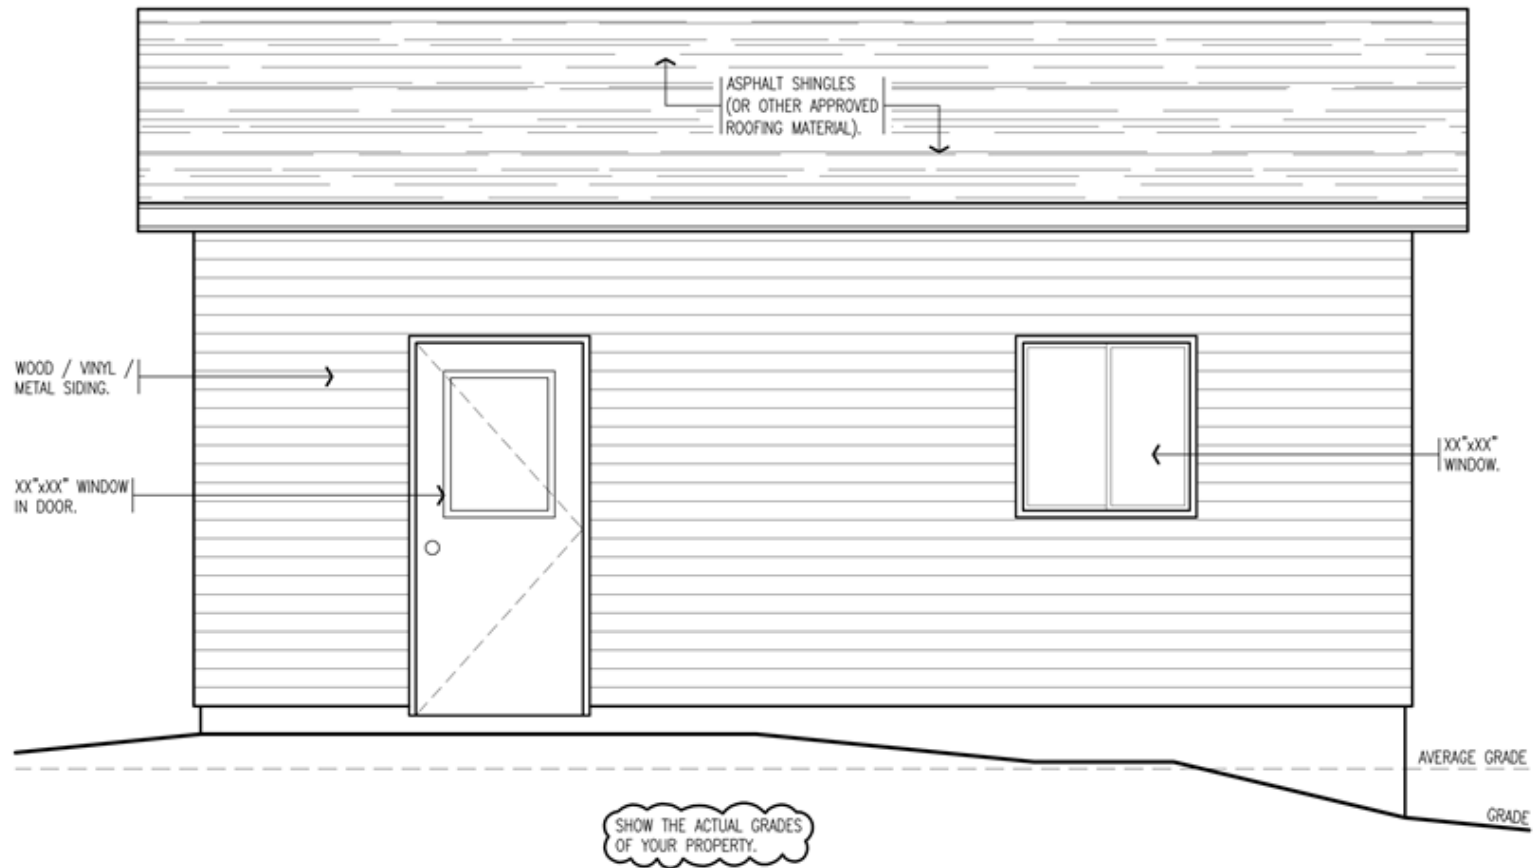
of 9: BACK ELEVATION – Accessory Structure
